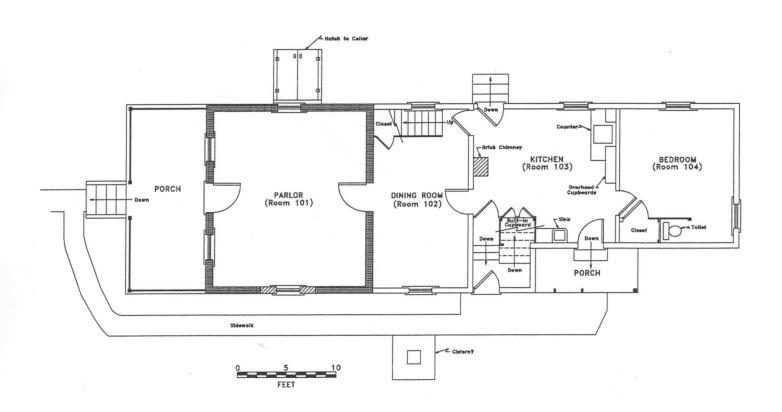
Ground floor plan of the Allard House, showing the summer kitchen addition and the recent modifications to the house, 1995.
